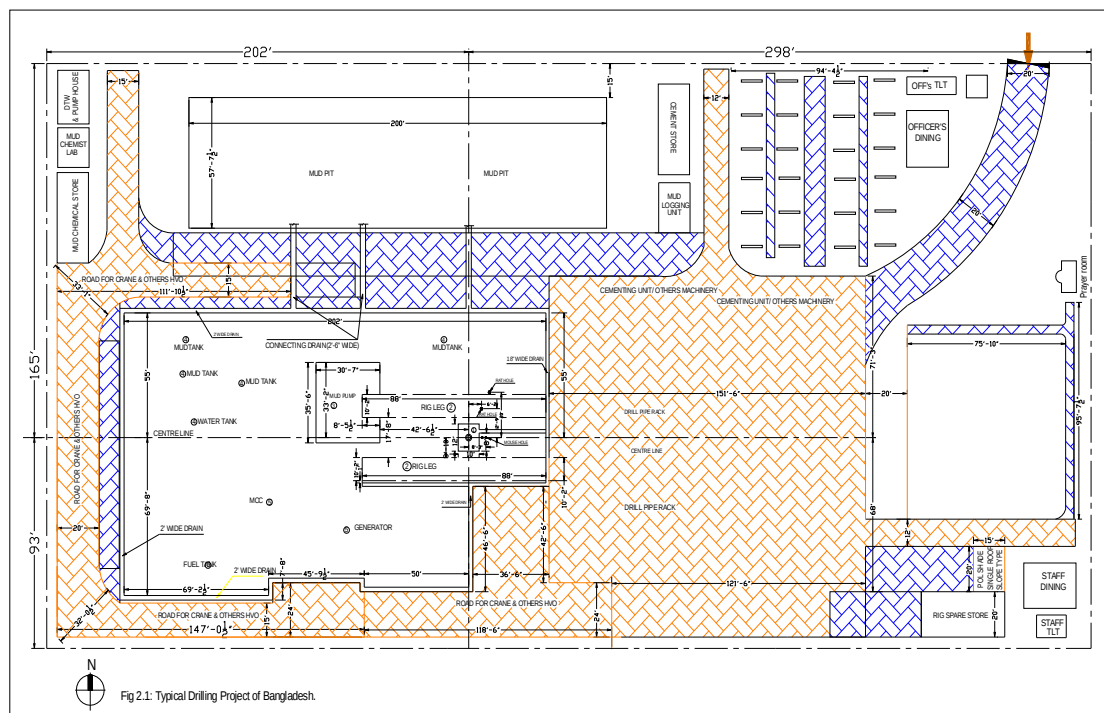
Typical lay out plan of an oil and gas well drilling project. (Rupgonj, Narayanganj)
